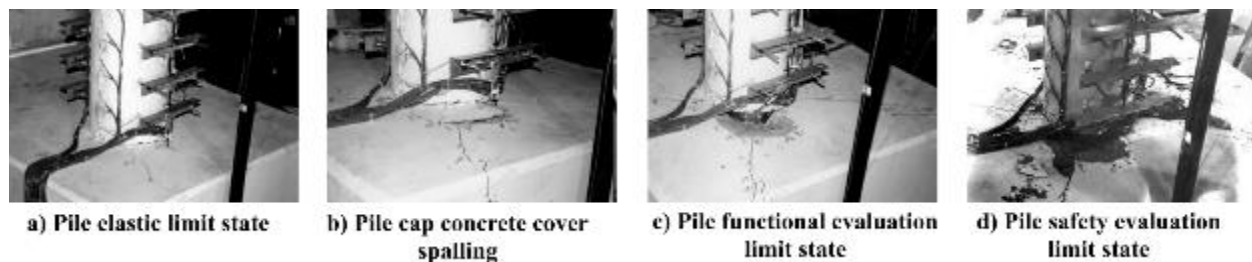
Limit states of test specimen STD2, (Silva & Seible, 2001)
